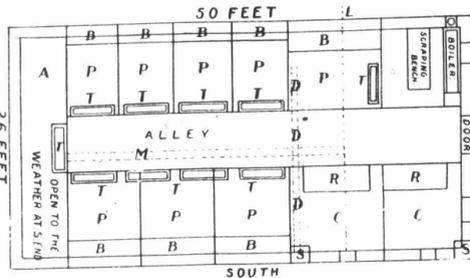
FIG. I. GROUND-FLOOR PLAN OF F. J. COLLYER'S PIGGERY AND HENNERY.
